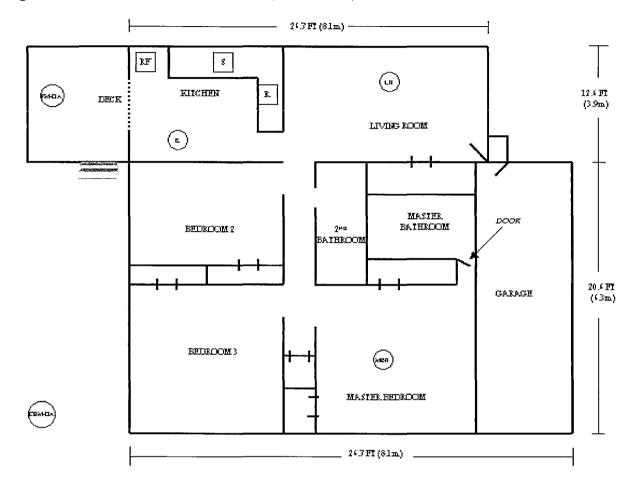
Floor Plan of the Test House (Not to Scale)
